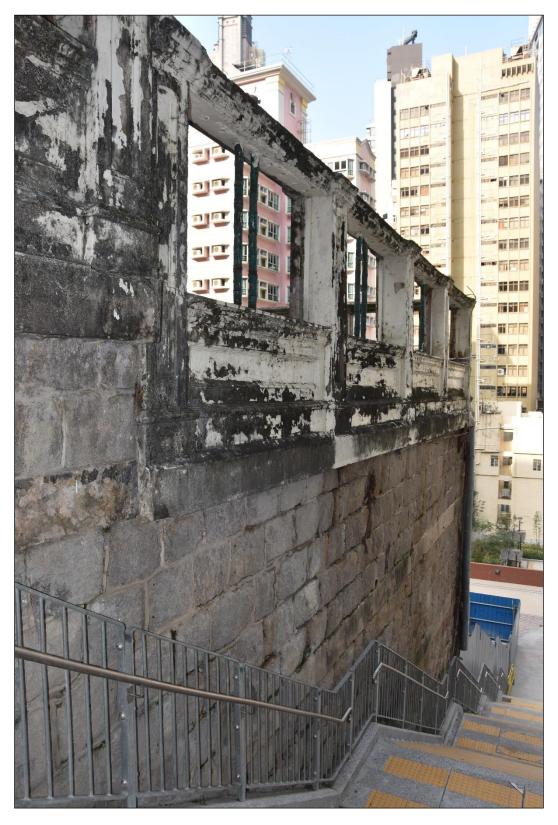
The boundary wall above the granite block retaining wall at north-east elevation (facing Queen's Road East), (8<sup>th</sup> October, 2024)
